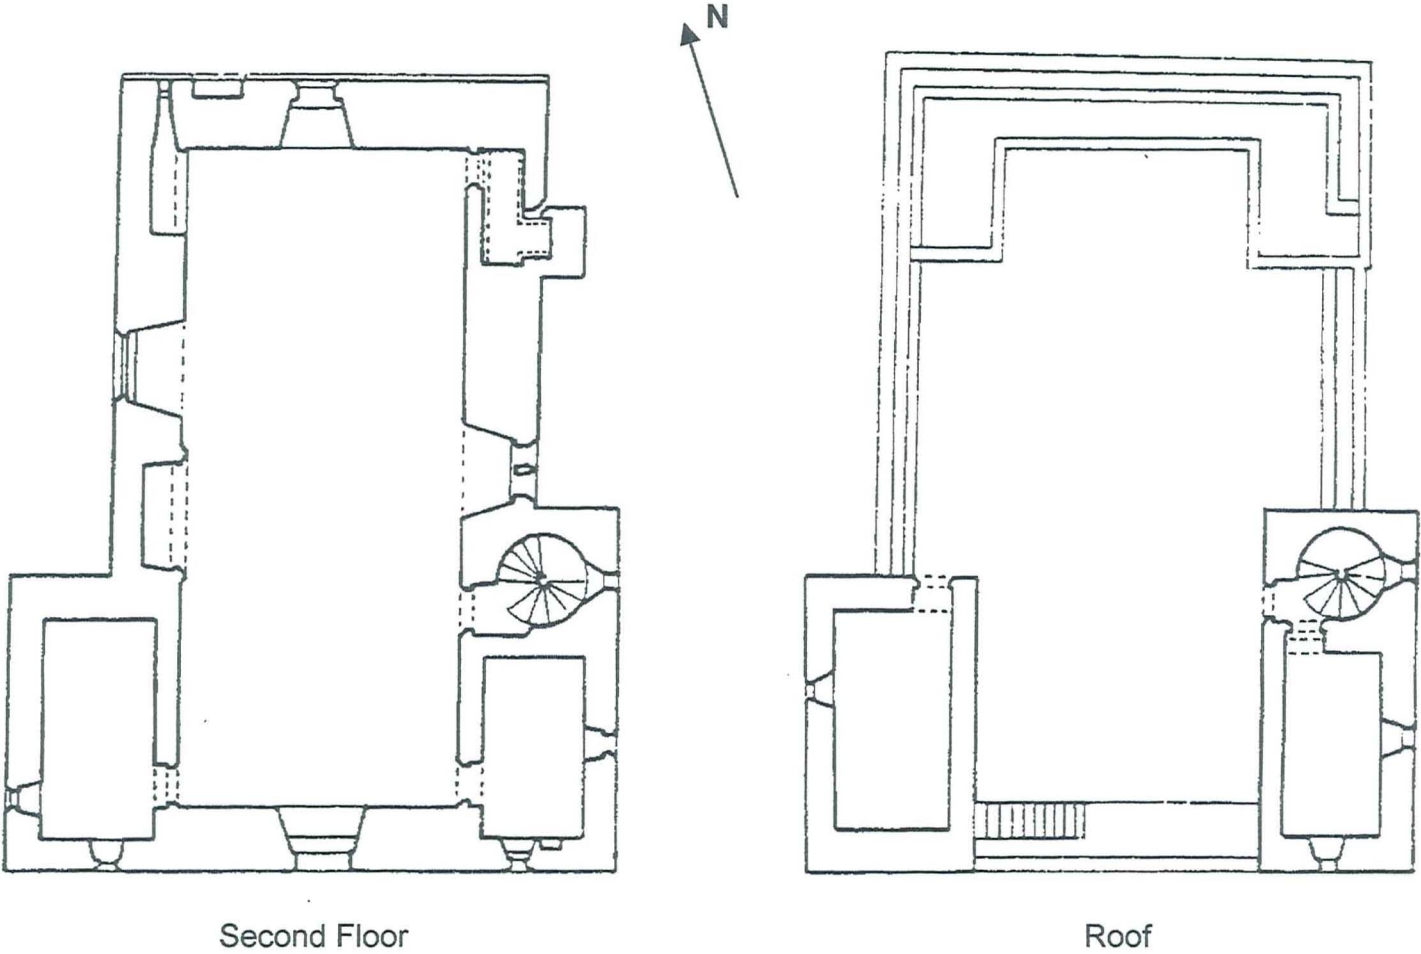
The Moot Hall, second floor and roof plans (Ryder 1994)
